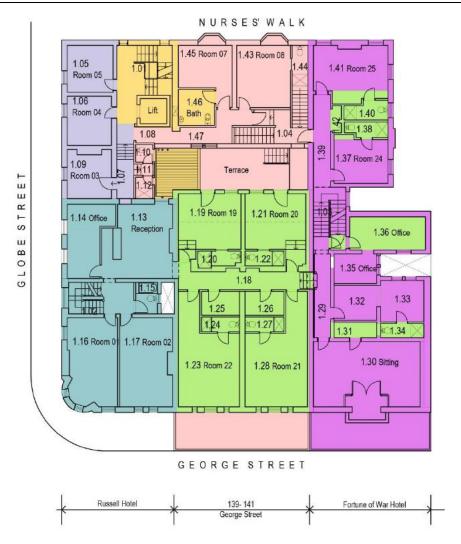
Phases of Development, First Floor Plan Level, TKD Architects (NTS)
